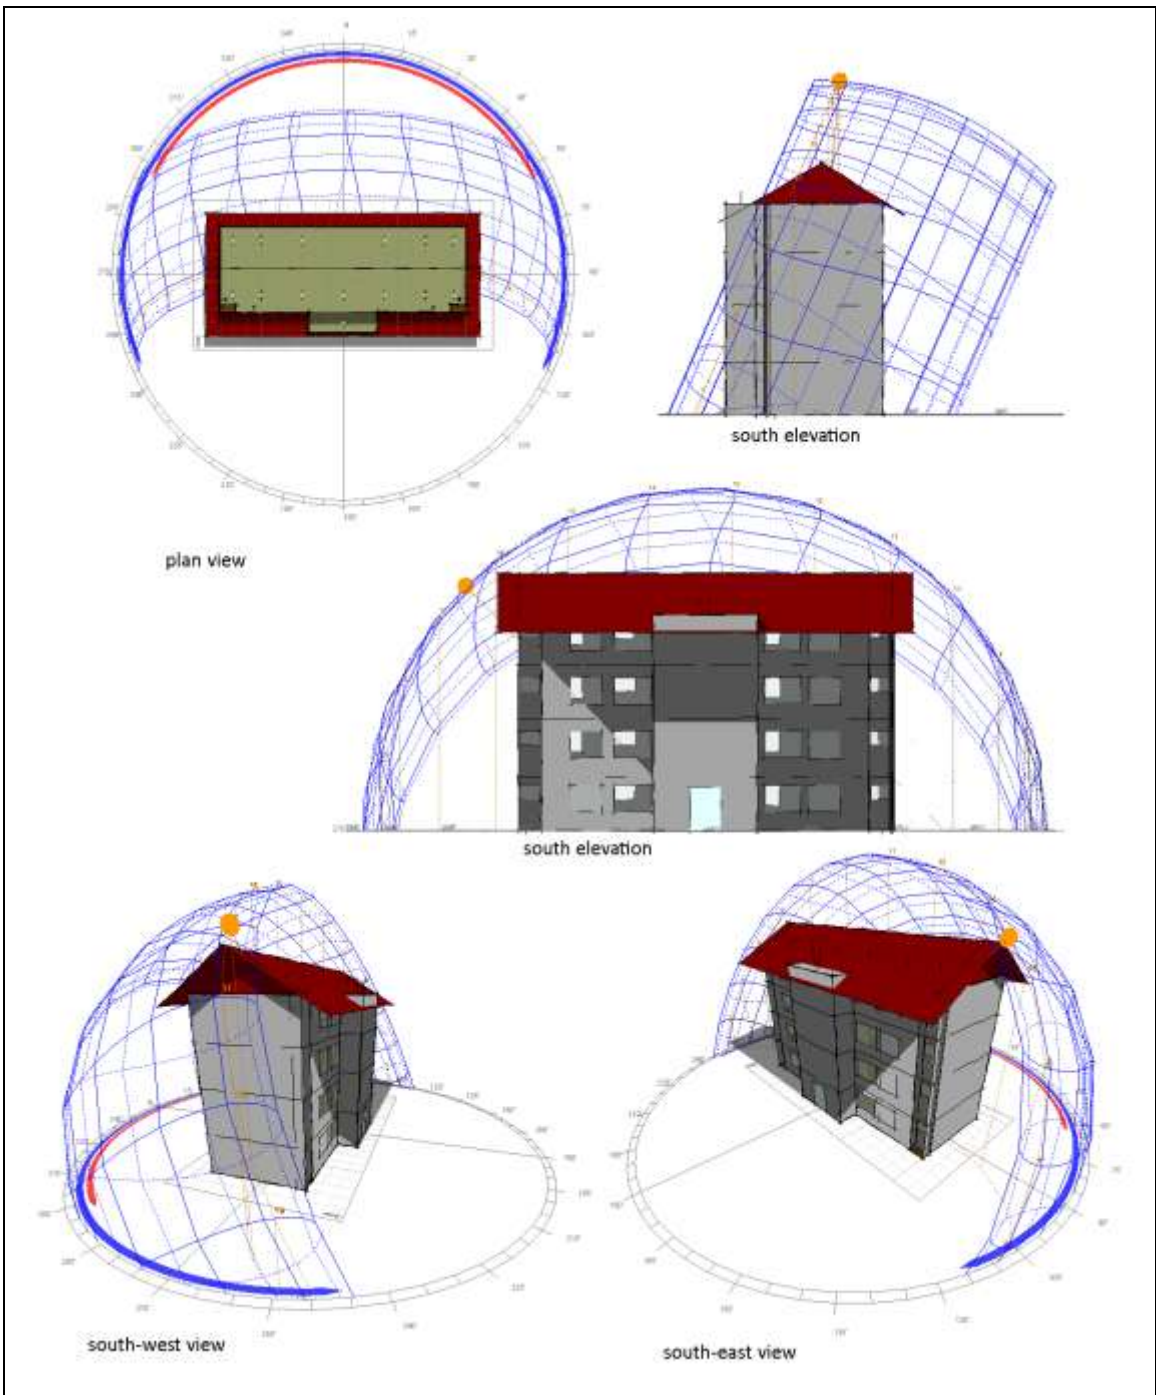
Voith building – extension all sides of roof. Image source: Ecotect 5.5.
